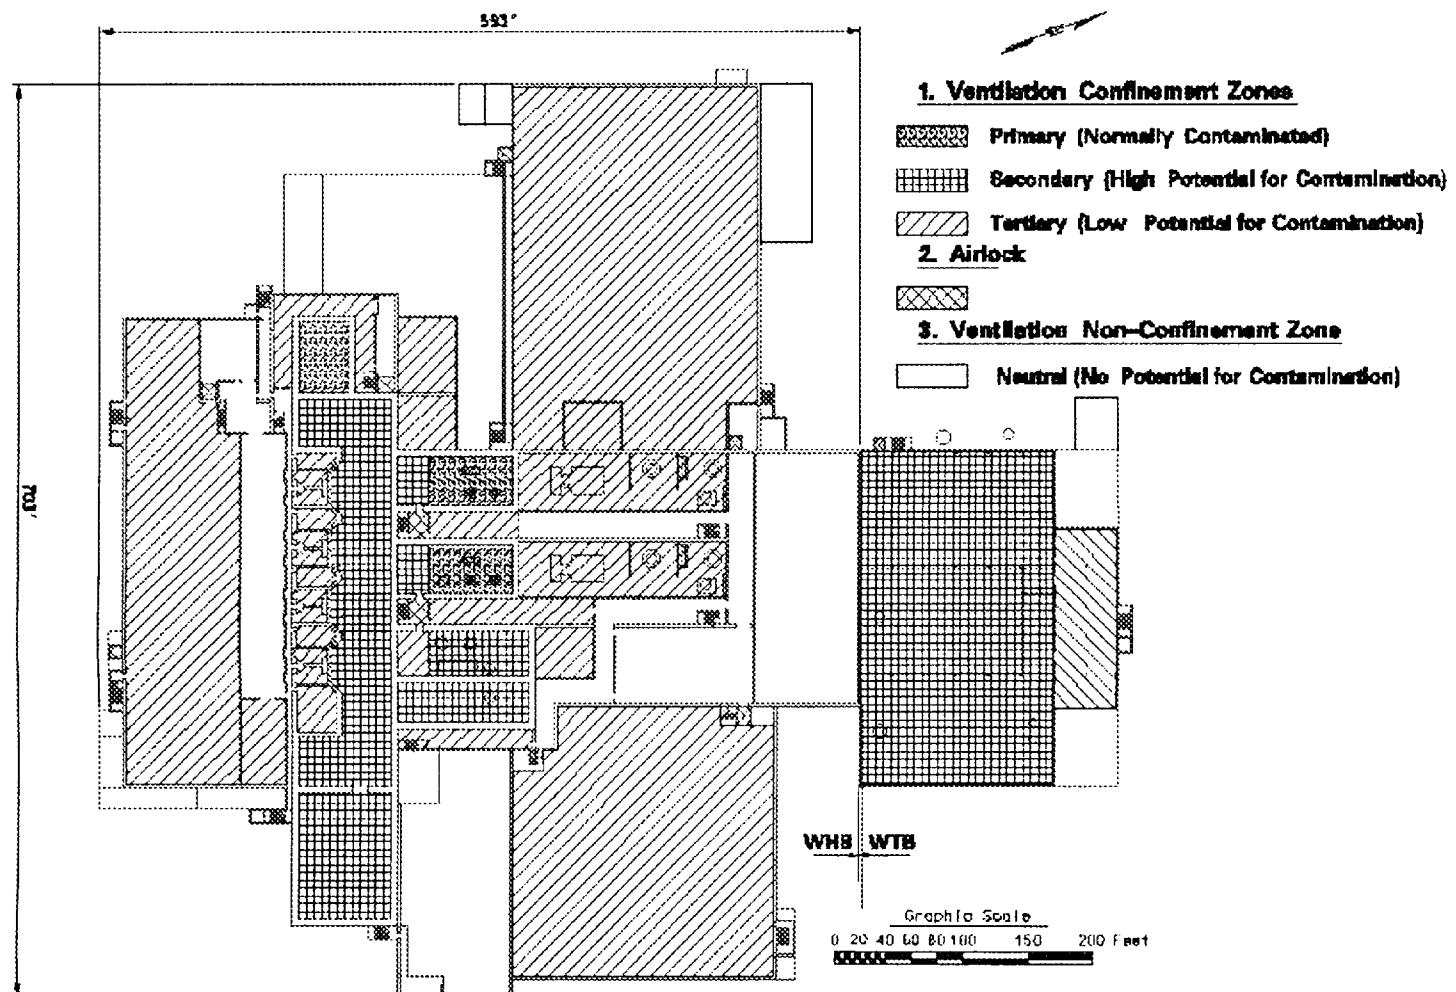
Waste Handling/Waste Treatment Building Confinement Zone Configuration – 30' Above Grade Level
